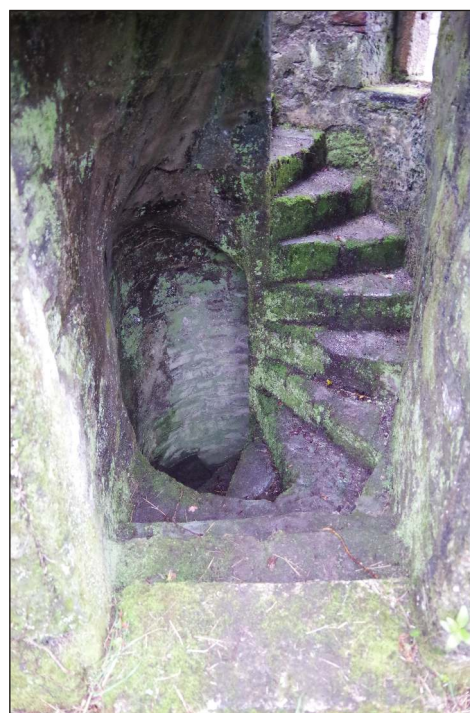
First floor of south turret stair of Betsy Grimbal's Tower, looking south-southwest
